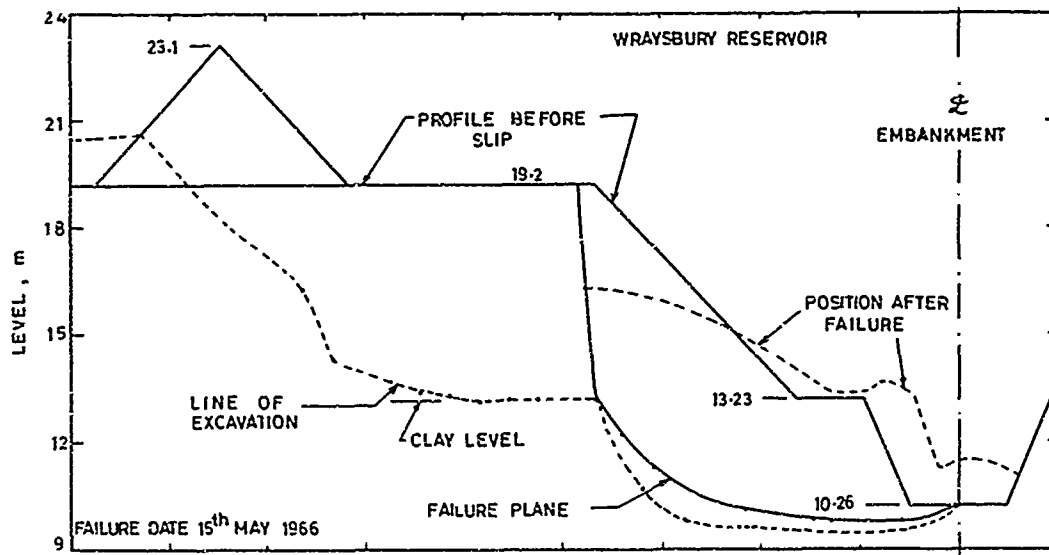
CROSS SECTION OF THE SLIP FAILURE AT 2 CHAINAGE 3684.9 m
